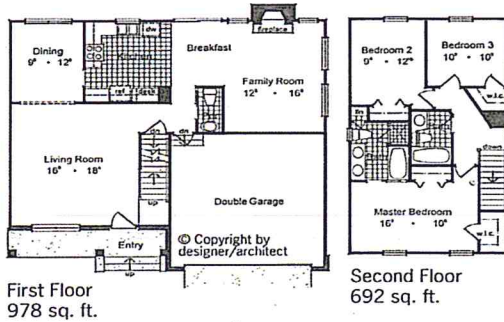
EXHIBIT B: SITE PLAN & PROPOSED DEVELOPMENT PROTOTYPE CONT'D
